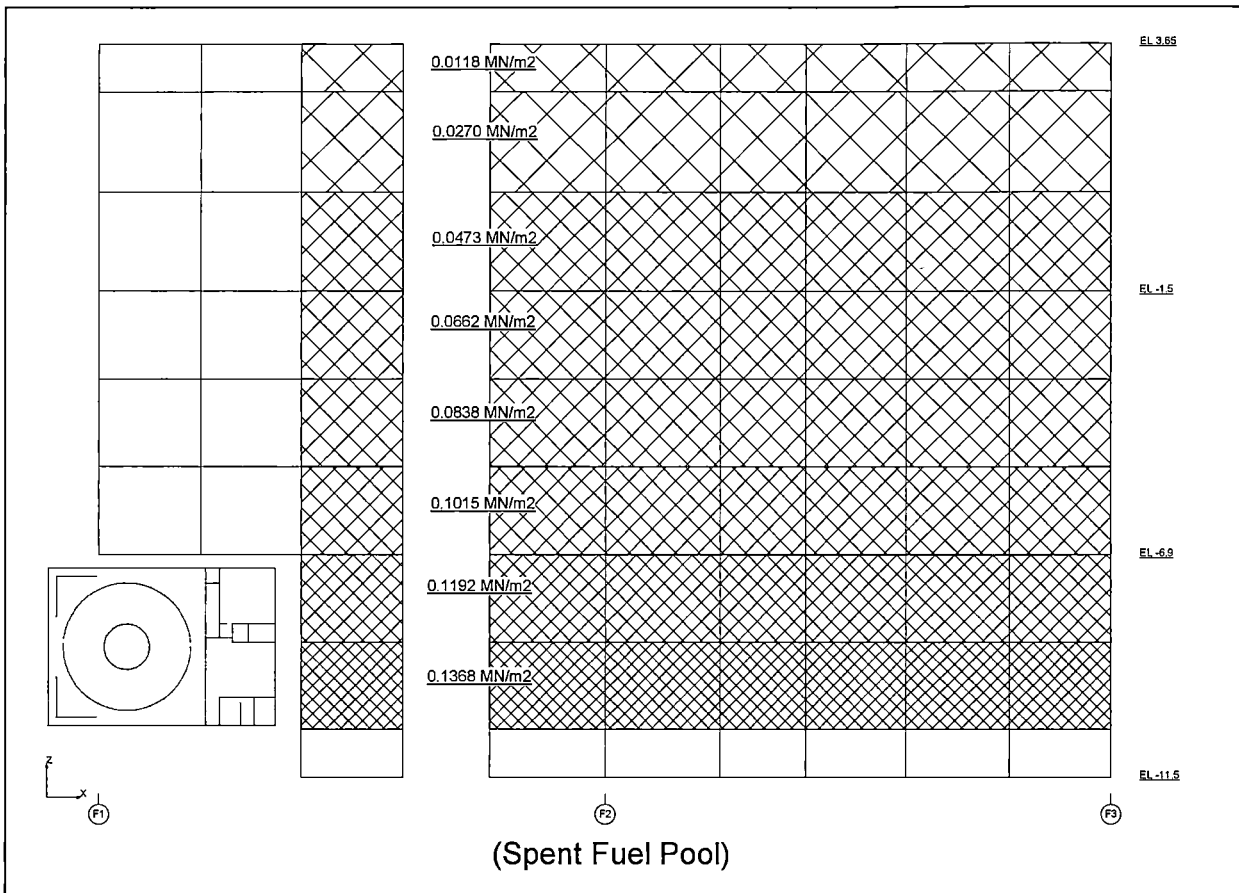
Hydrostatic Loads on the Inner Wall at EL -11,500 (2)
